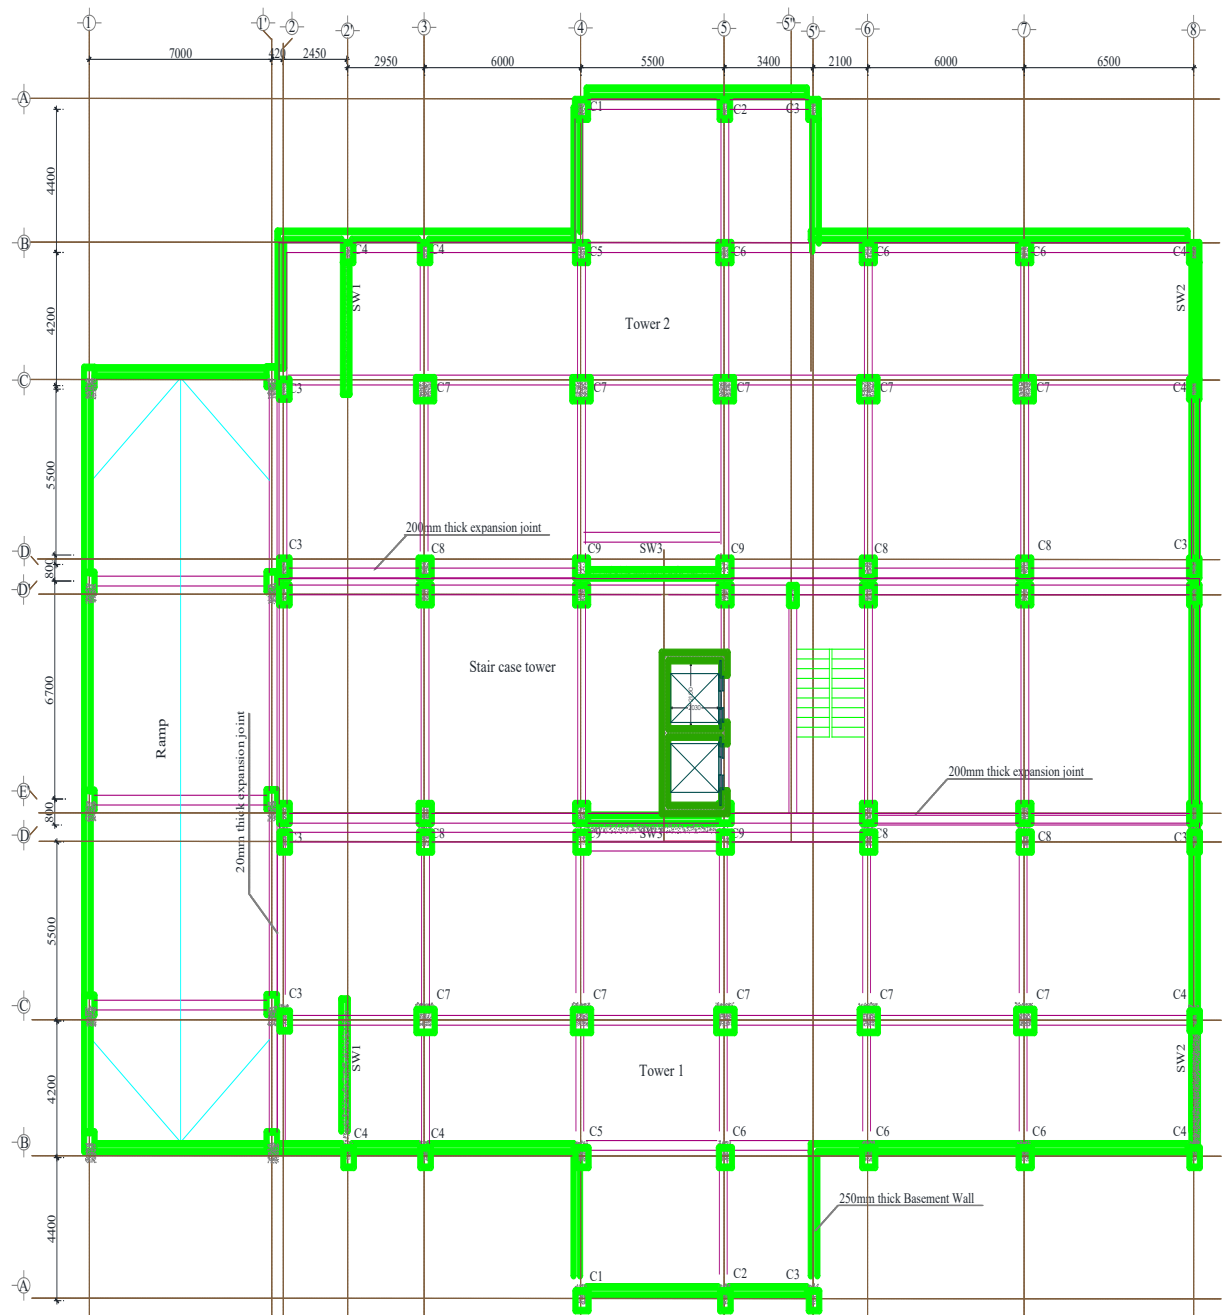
Structural layout of the building with its expansion joint at basement floor 2
